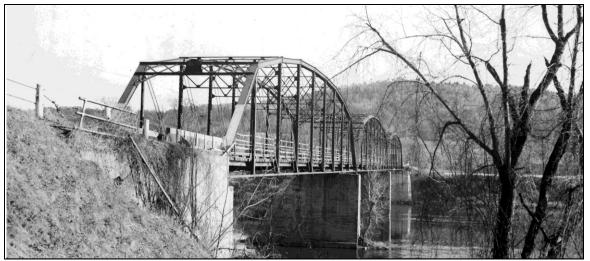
Ascutney Bridge, built 1908. Photo of downstream side in 1940. Parker Truss designed by Storrs & Storrs. Demolished 1969 (NHDOT 1940).
